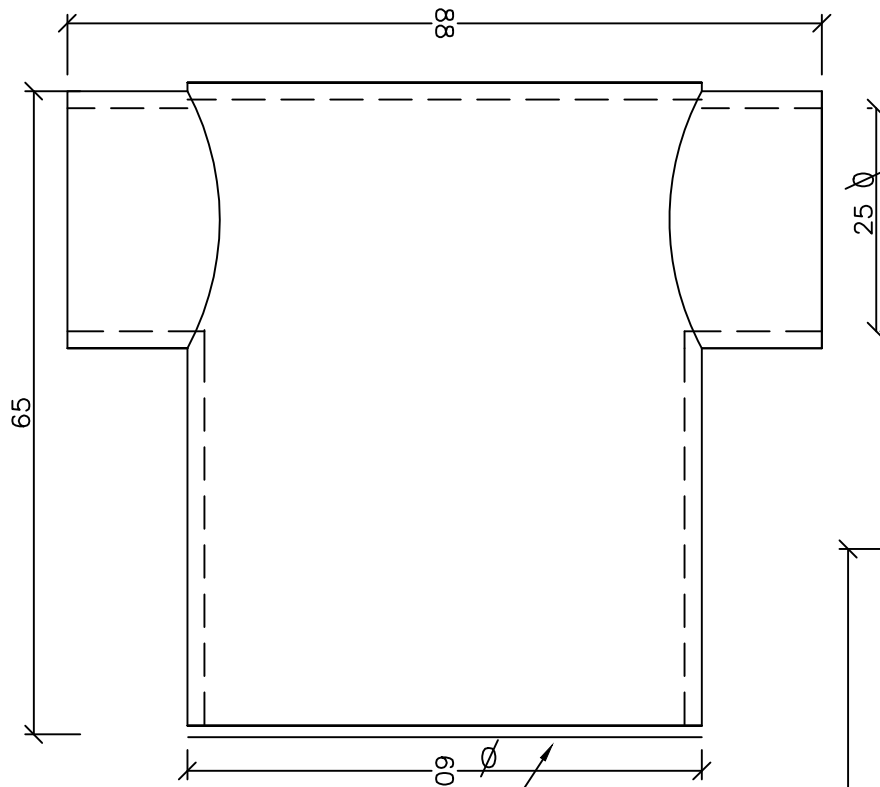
DETAILS OF PVC BOX FOR INSTALLING CEILING FAN
